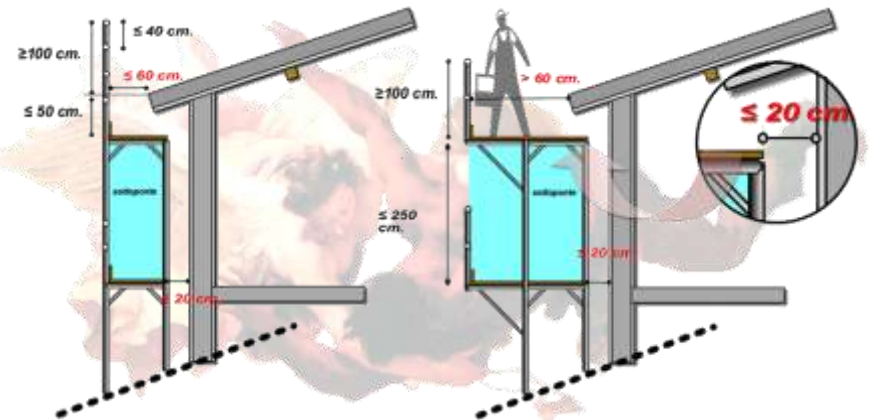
(f): Inside standards supporting ganchaling adjacent to a flat roof structure.
